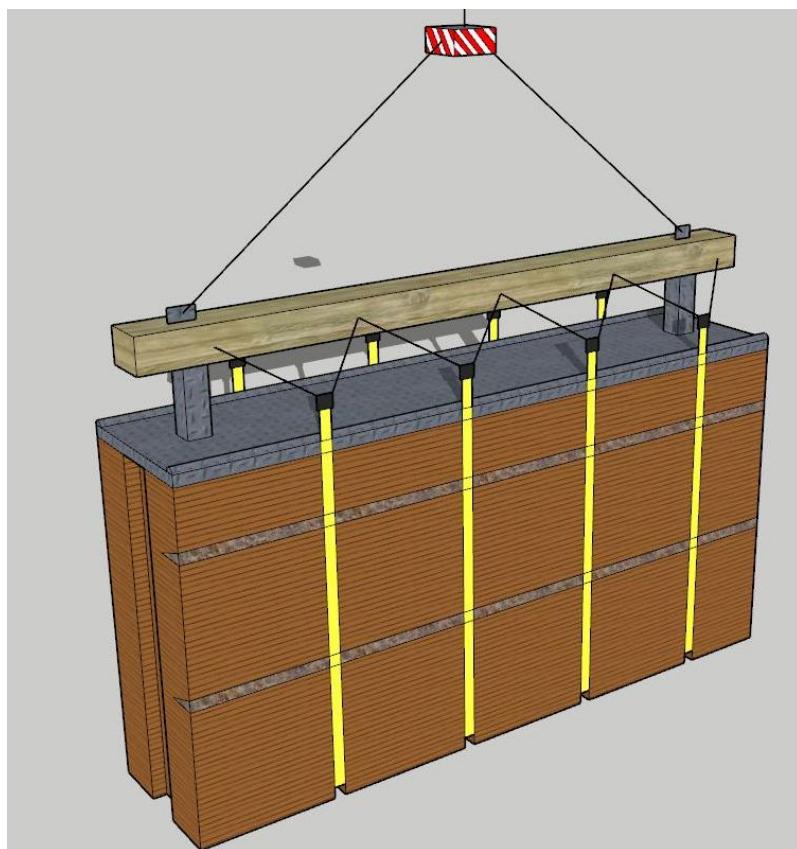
Transport construction for heavy rammed earth elements⁸¹
